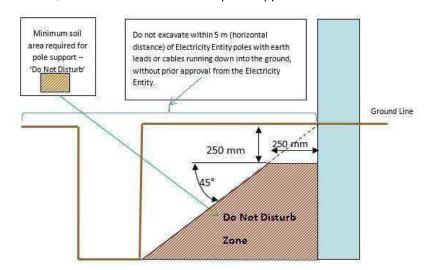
Do Not Disturb Zone requirements when excavating near poles
